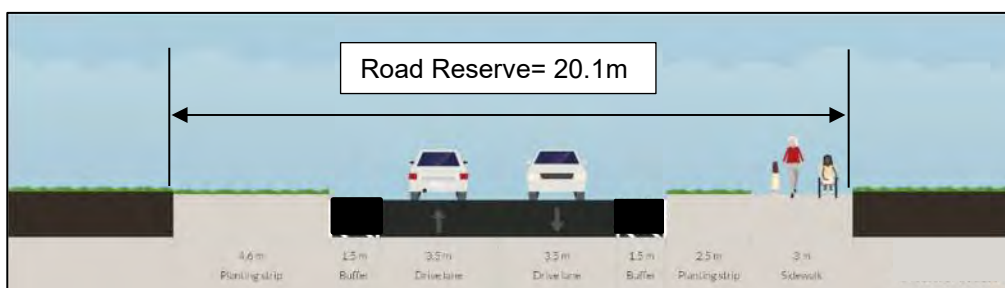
Proposed Cross Section for Lamb Street and Cambridge Road
